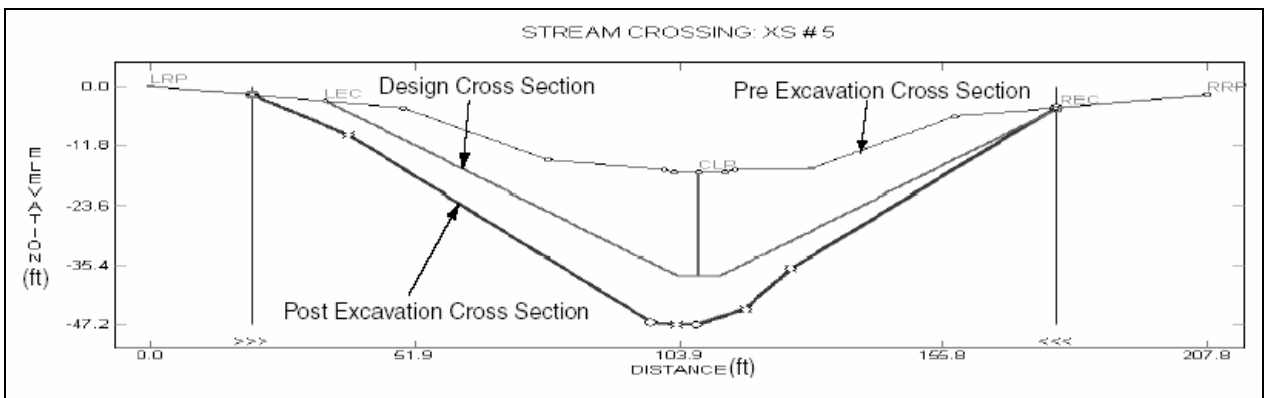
Redwood Creek 1311 Road Site #3 – Stream Crossing Pre & Post Excavation Cross Sections.
